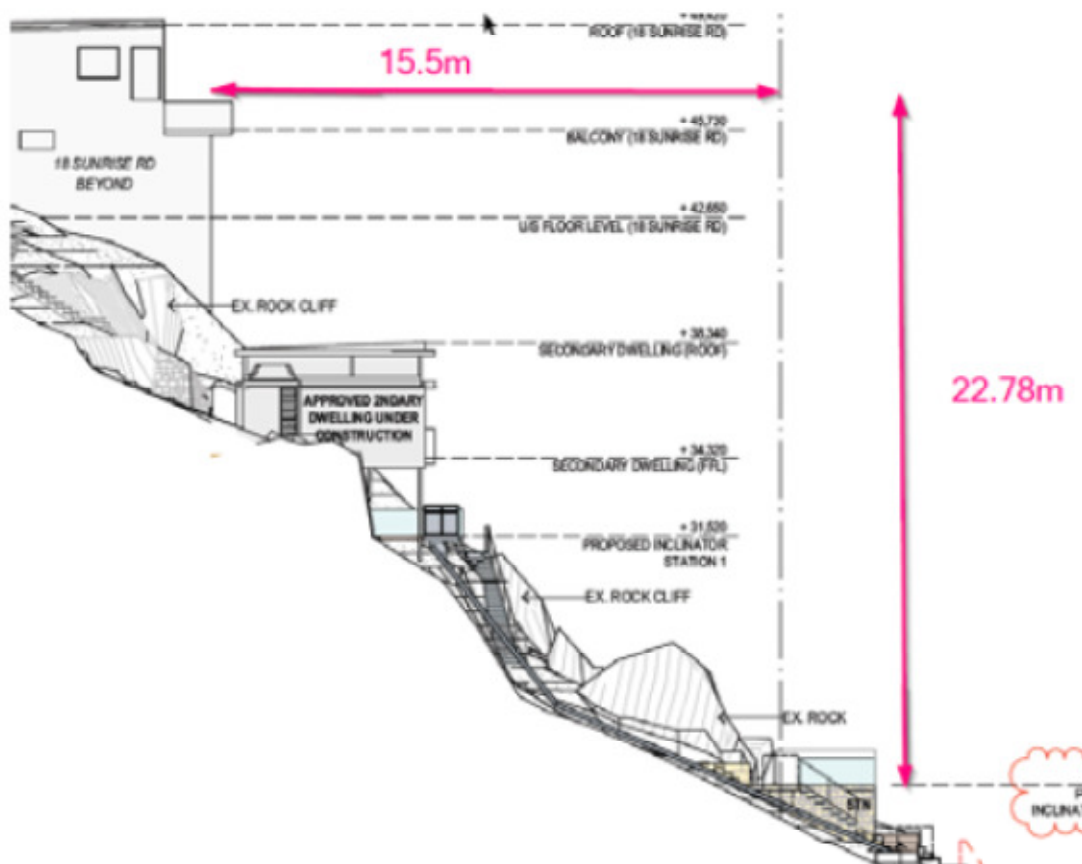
Diagram provided by applicant showing proximity of the pool/spa area to 18 Sunrise Road.
